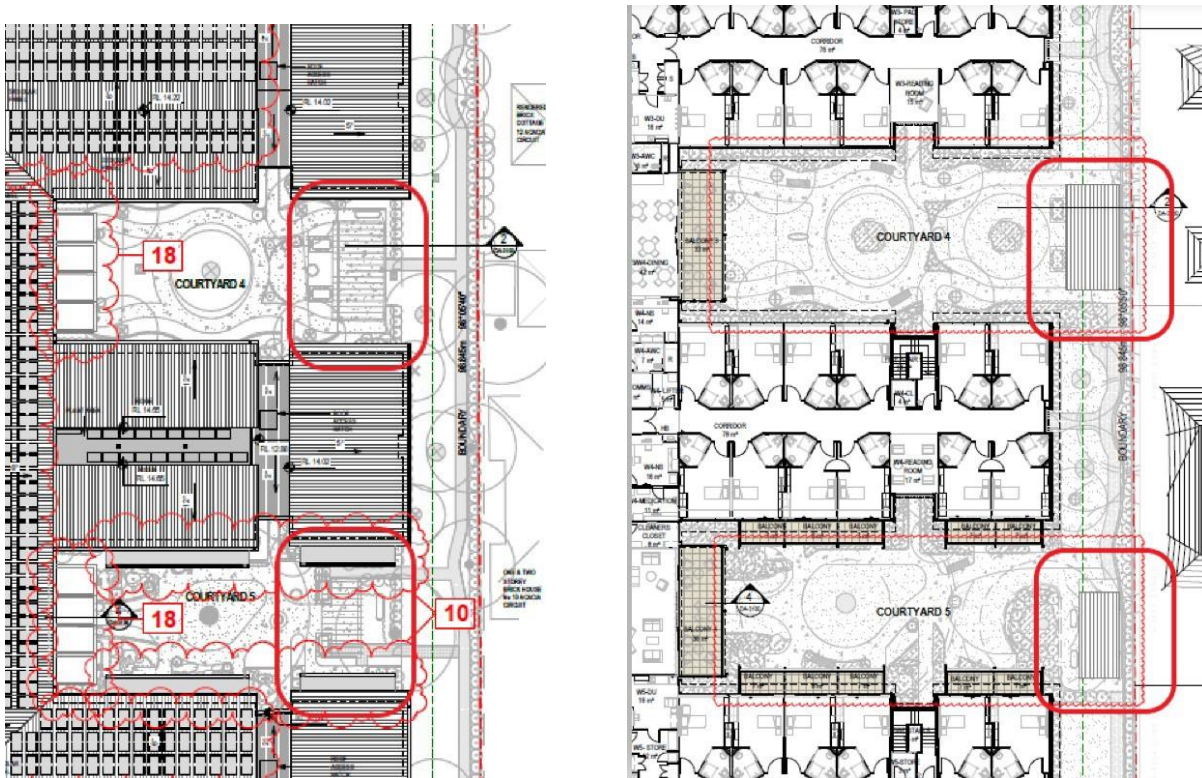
Approved location of timber pergolas in courtyard left, proposed location of timber pergolas right.
